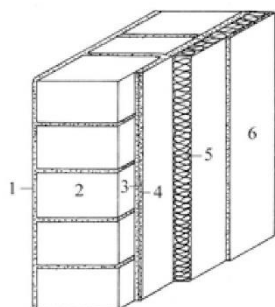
Interior wall insulation with wood-fibre board [17, p. 92]
